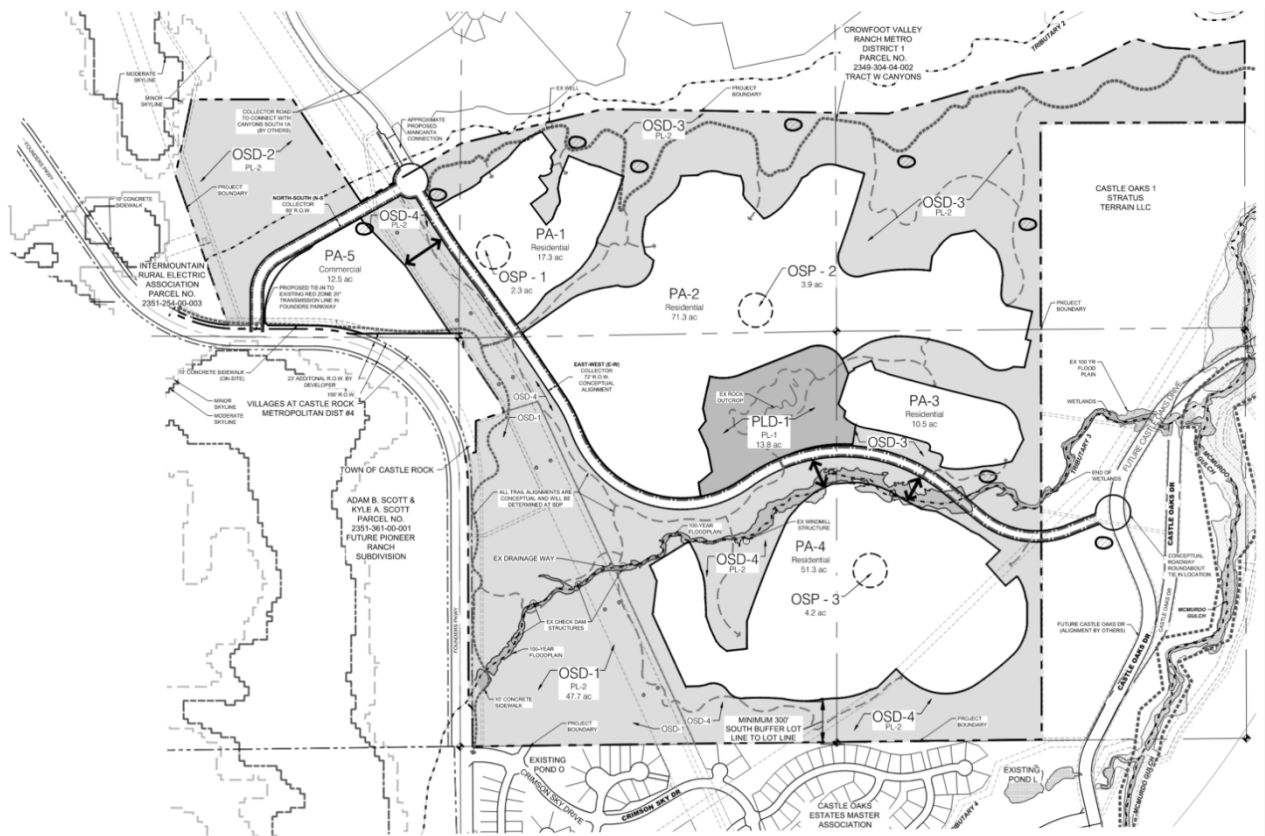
Canyons Far South – Planned Development Plan and Zoning Regulations Amd 1
